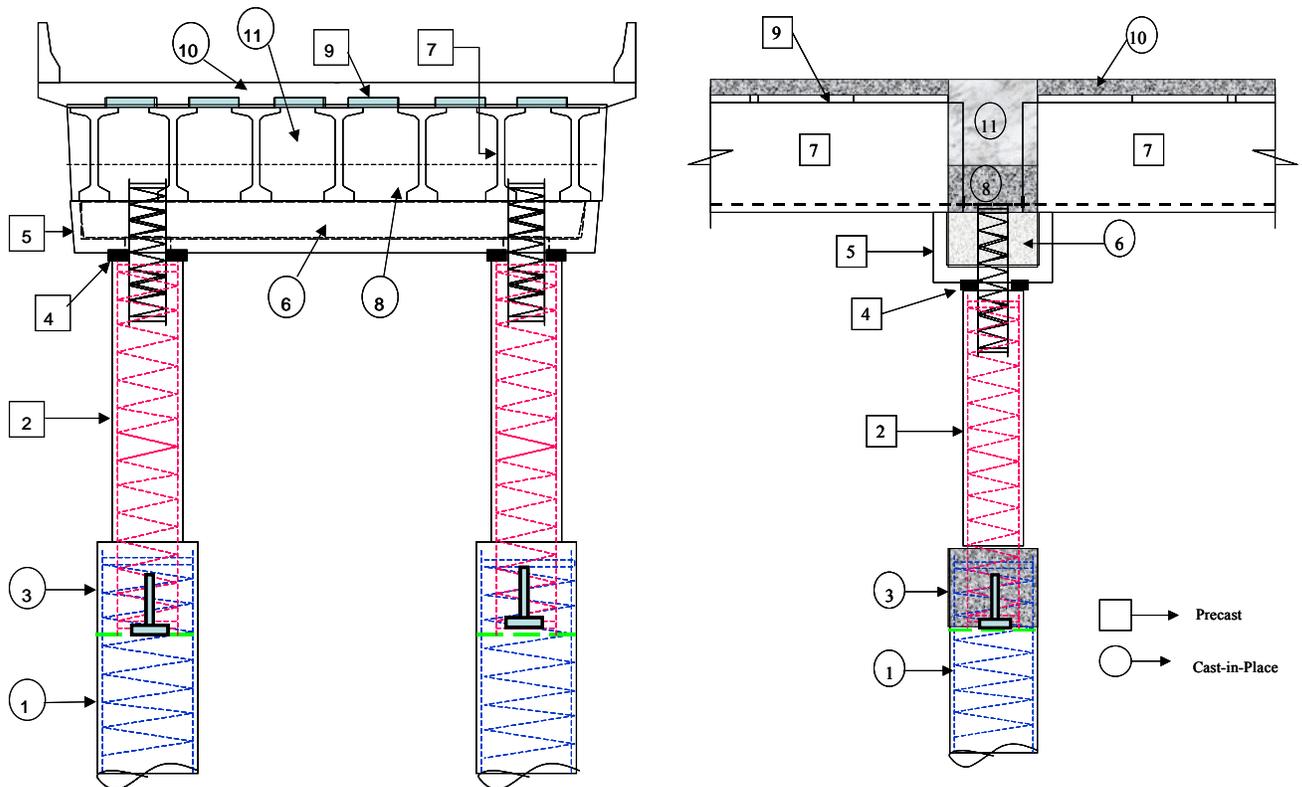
Conceptual Design and Detailing for a Precast Bridge System
